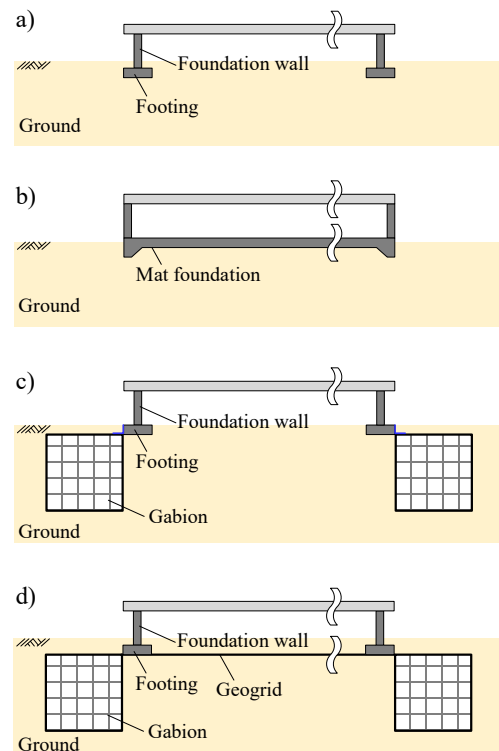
Schematics of the foundation and countermeasures (a) strip foundation, b) mat foundation, c) geogrid gabions applied to existing strip foundation, and d) geogrid gabion applied to strip foundation for new construction).
